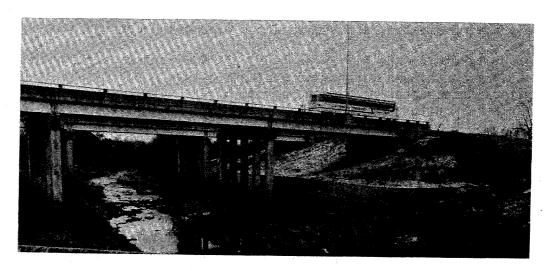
Use of steel sheet-pile bulkhead as a countermeasure for slumping of abutment fill-slope. (North Branch Ward Creek, La., Site 199.)
